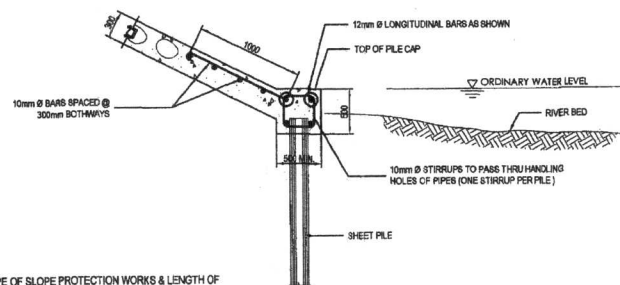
DETAIL OF SHEET PILE WALL WITH CURTAIN WALL
